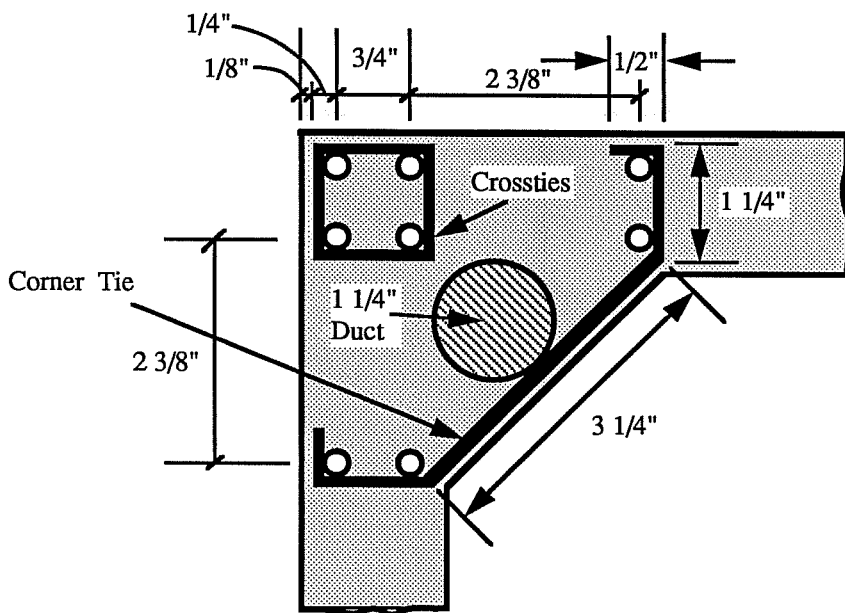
Specimens 3S and 3PM Reinforcement Layout
